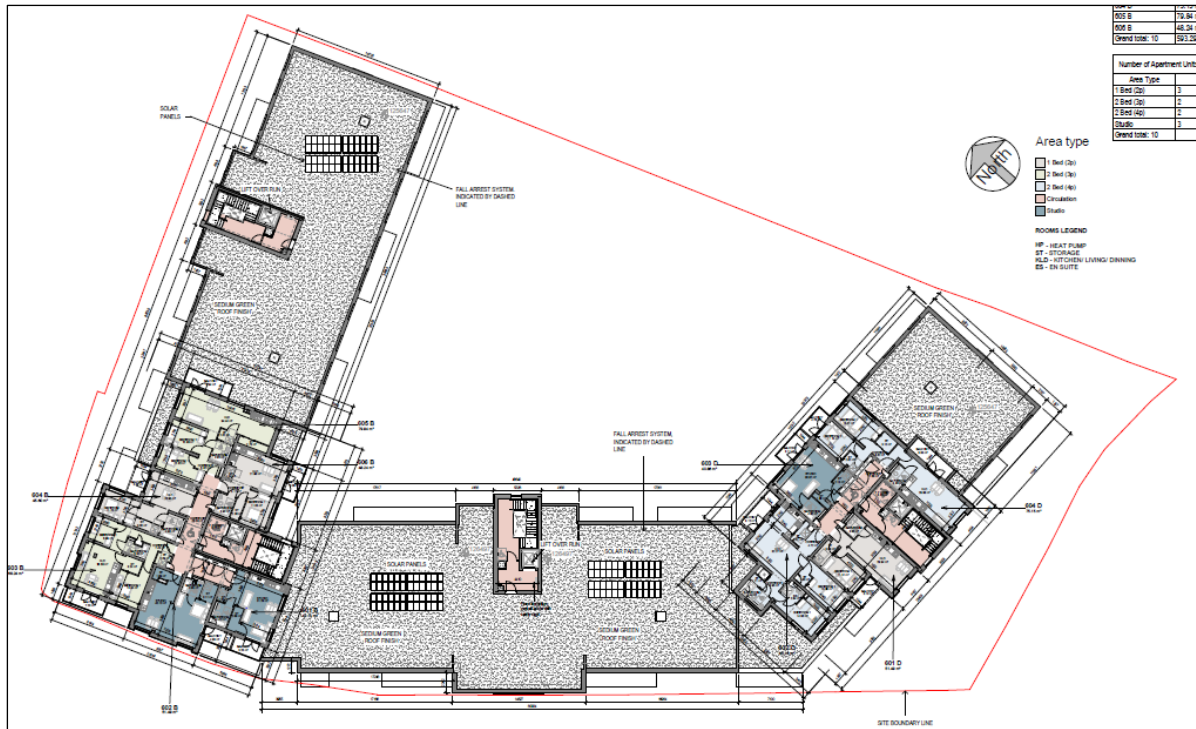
Sixth floor plan of proposed amended development under ABP Ref. ABP-307177-20
